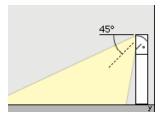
'Dark-sky' lighting concept illuminating ground plane only
